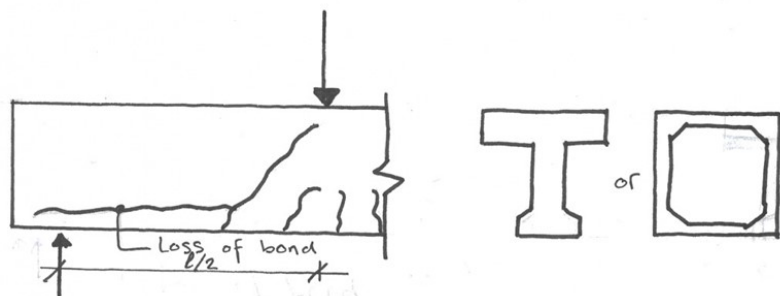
Cracking pattern of a beam with shear-tension failure (Samad et al., 2016)
